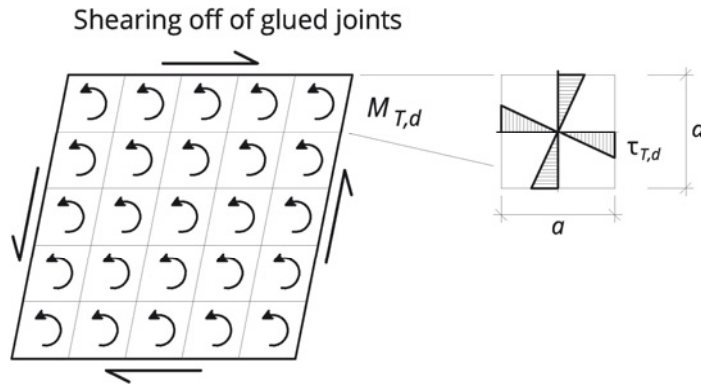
Shearing failure of the glued surfaces in the intersection points
